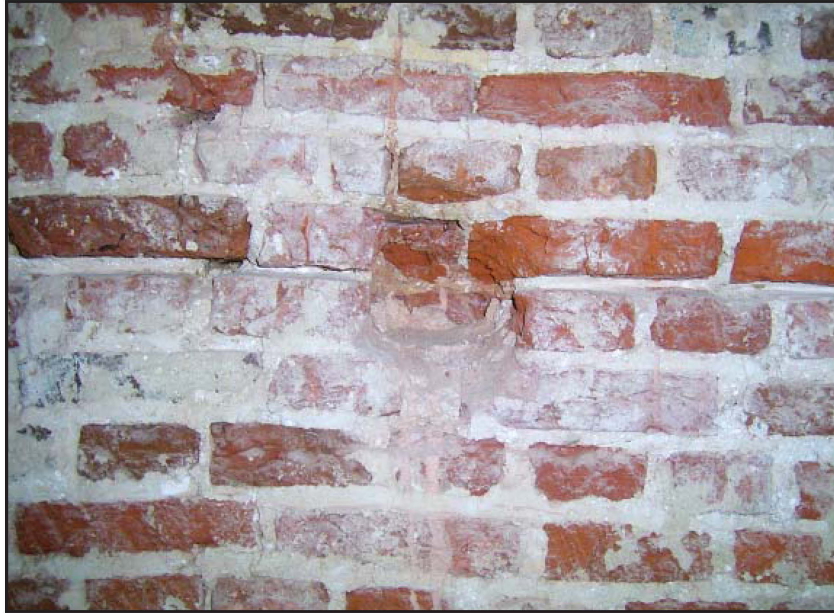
East elevation, internal view, second floor, showing possible south Tudor putlog (south)
